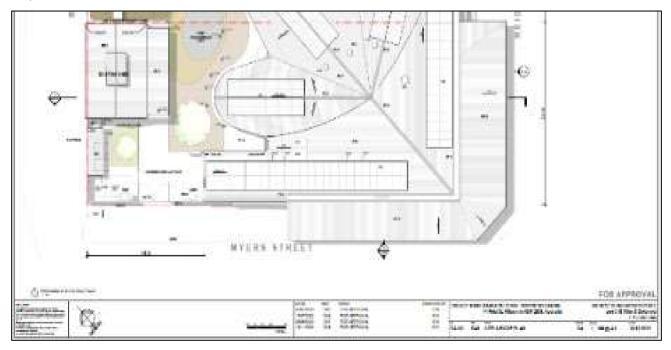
Site plan of new Baaka Cultural Centre at 44 Reid Street Wilcannia (Source Kaunitz Yeung Architecture 2021)
